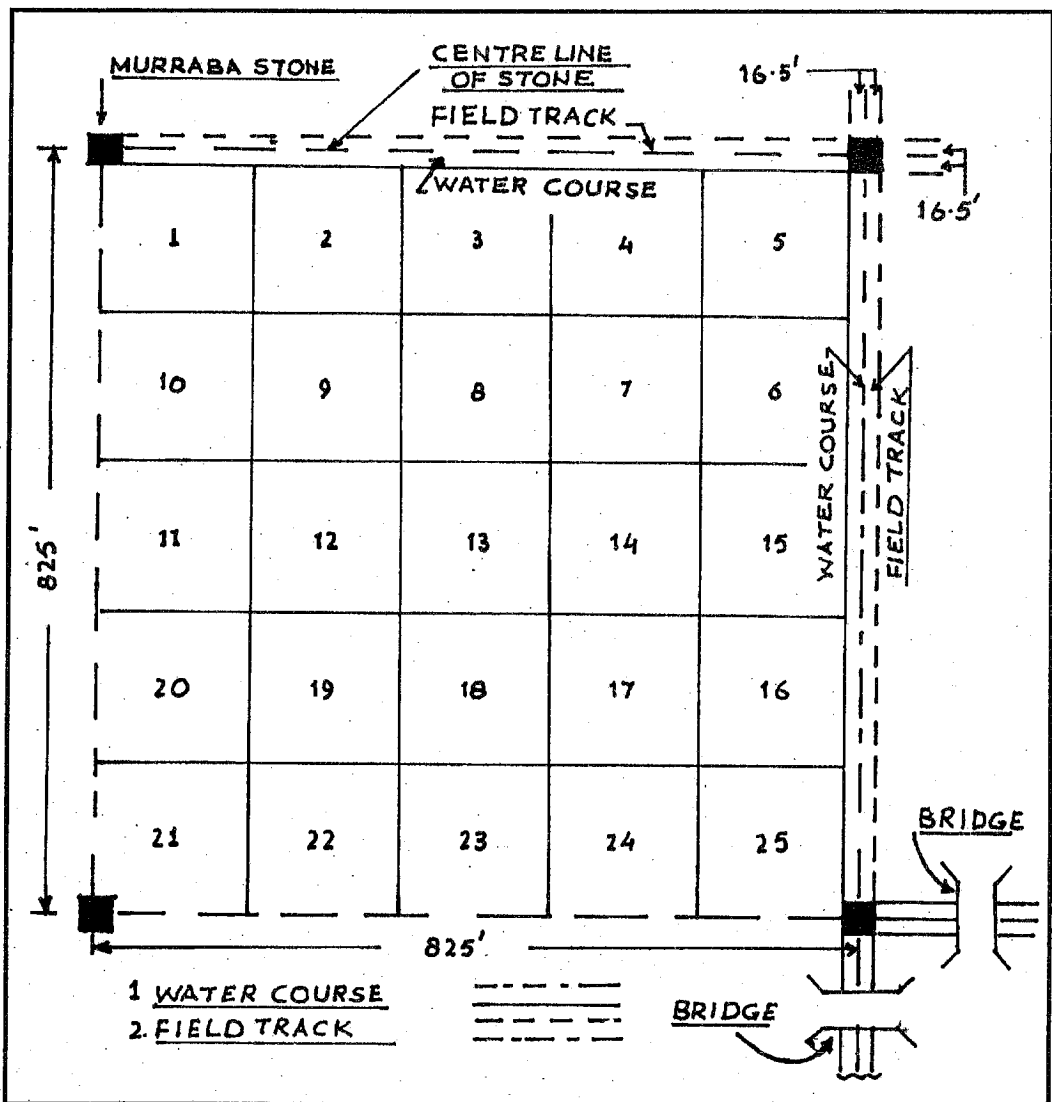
Sample Layout of Chak Plan of I.G.N.P. Area.
